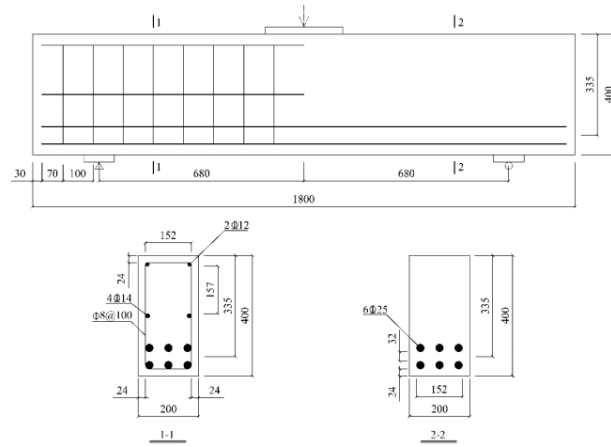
Reinforcement details for test specimens studied by Wang and Xian, (2020)
